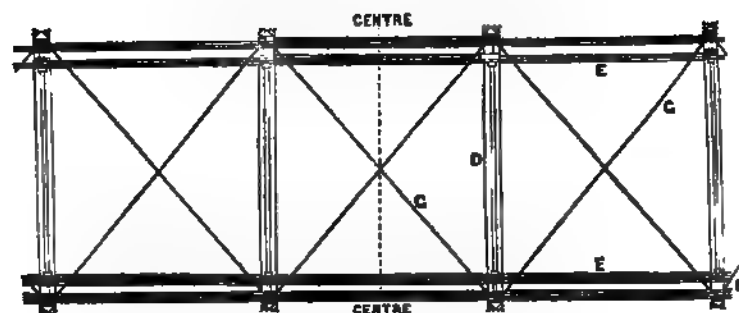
Plan of the roadway. G G are brace-rods. E E, bottom chord. D are floor-brams.
